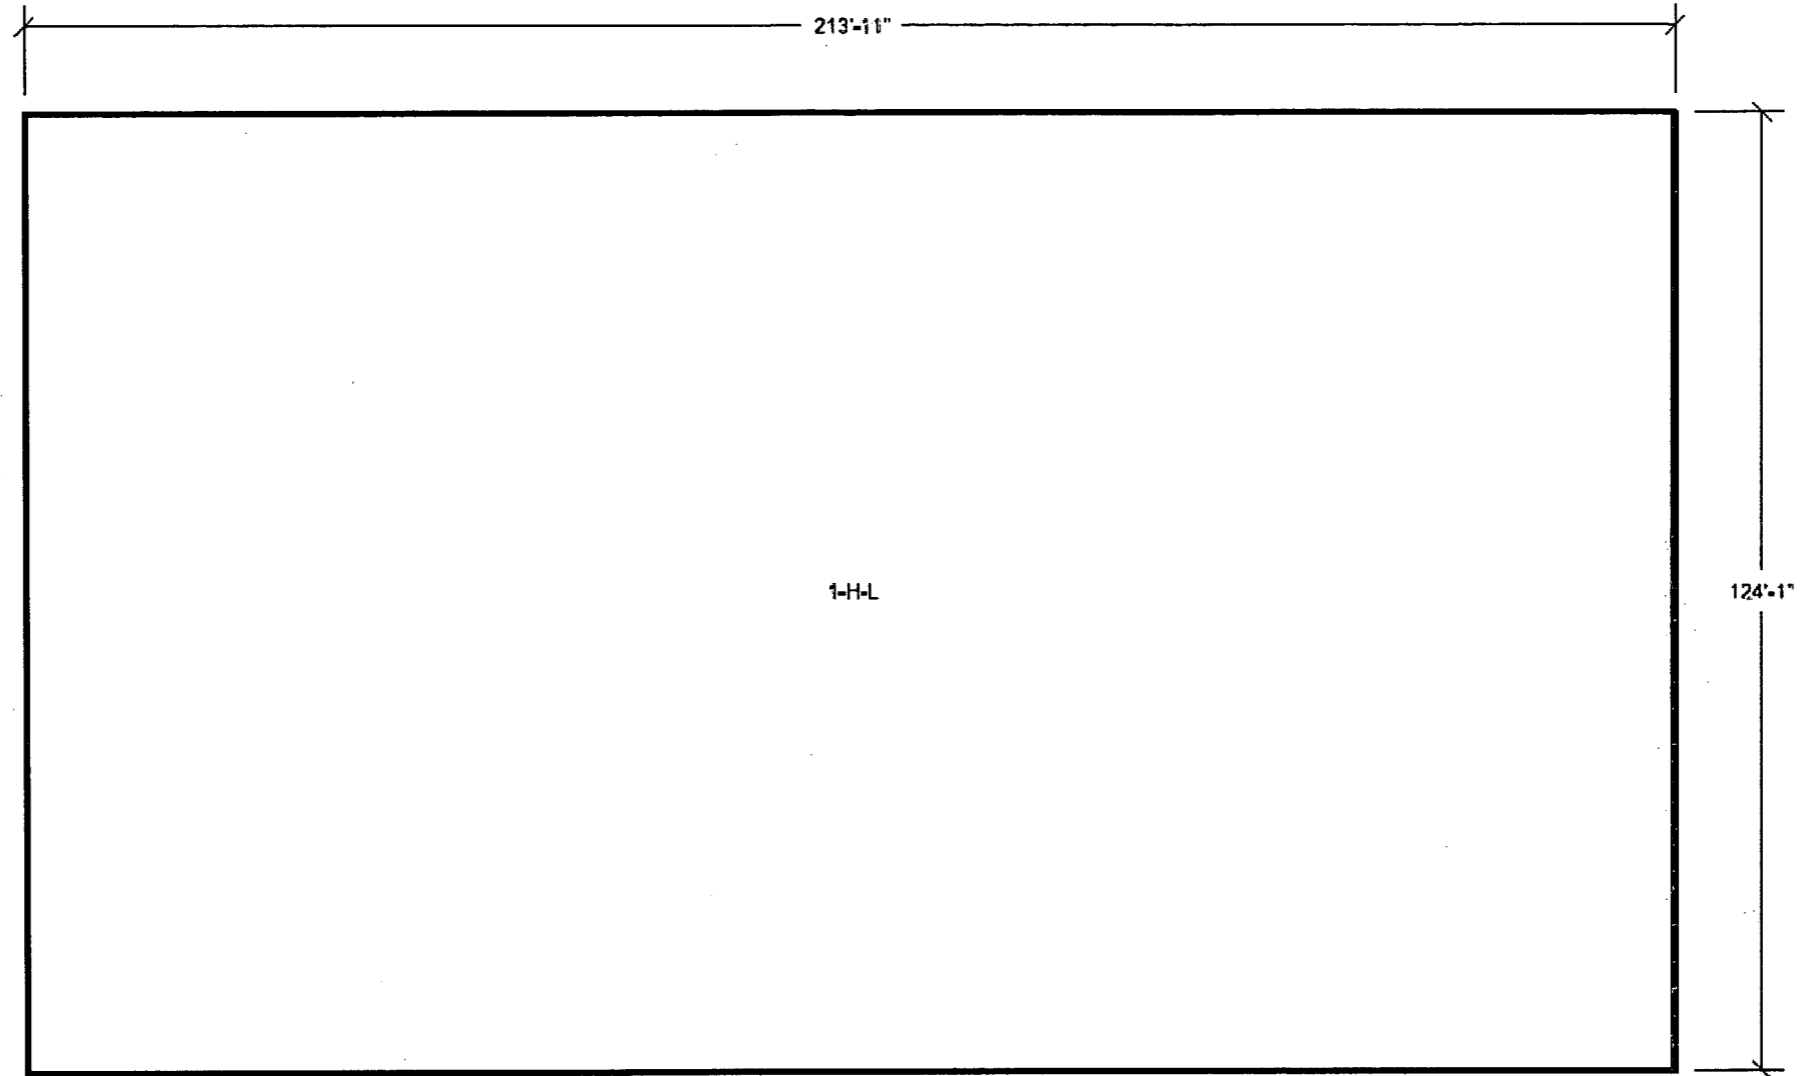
H.3-36: ELEVATION 95 LOOKING DOWN
